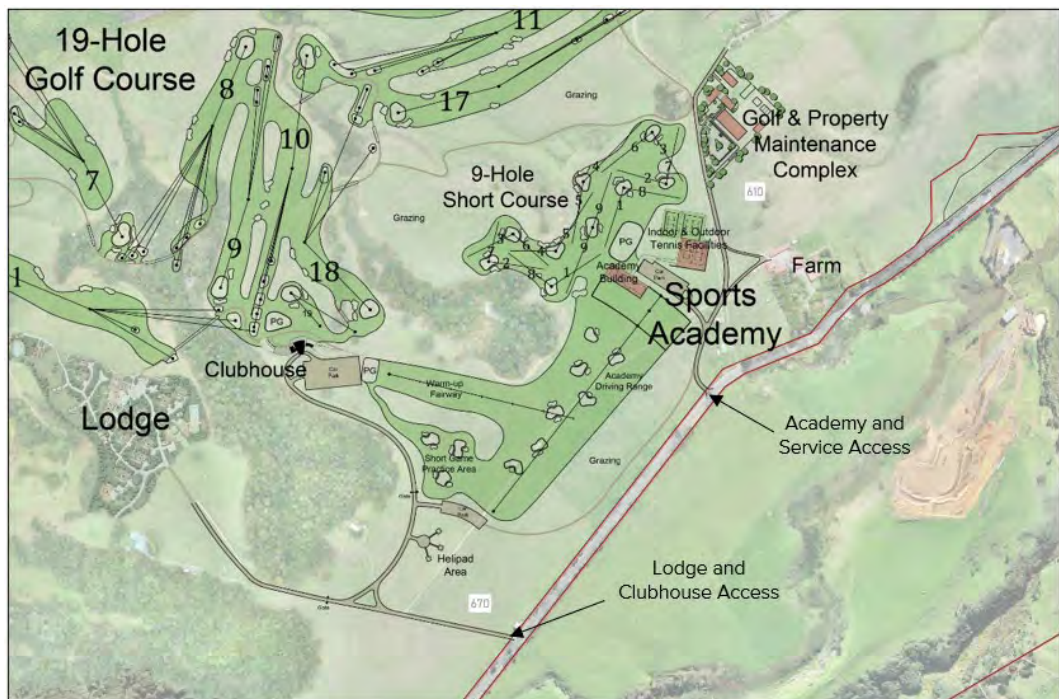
Plan showing locations of proposed vehicle crossings and internal roading
